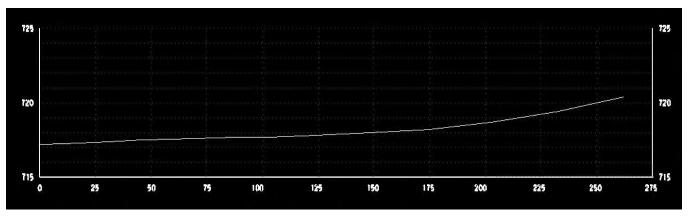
Profile of Spot Elevations in Ramp D – Note: LowPoint is Beyond (Northwest of) Station Zero
